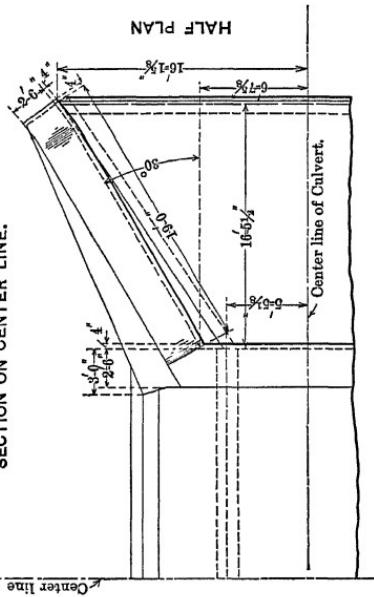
N. Y. C. & H. R. R. Standard 12 x 12 Arch Culvert
